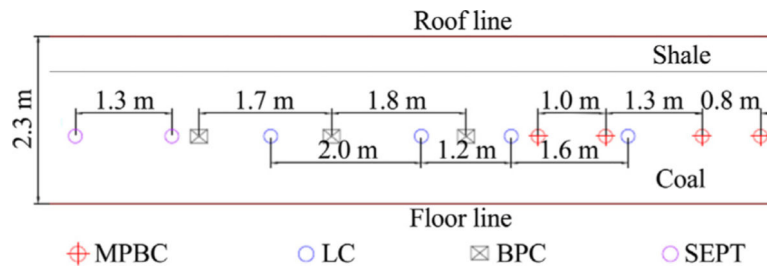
Instrumentation type and location for the cross-cut side of instrumented pillar at site-1.
